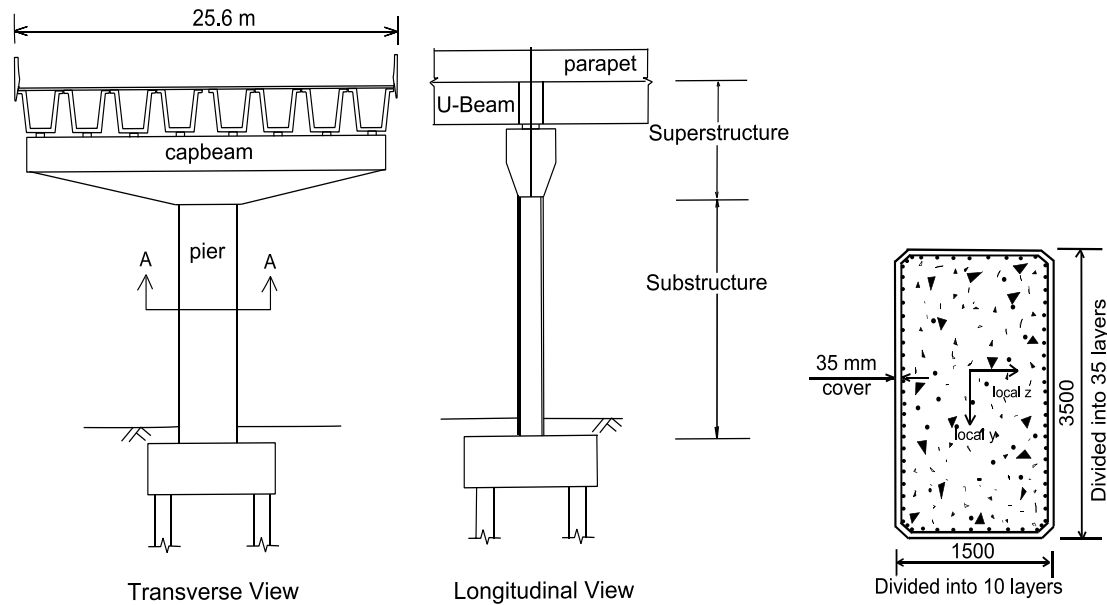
Sectional view of the Samudera Bridge: transverse view (left) and longitudinal view (right).
